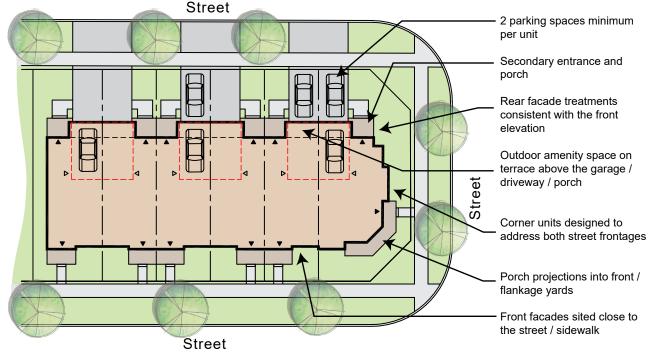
Conceptual Demonstration Site Plan For Dual Frontage Townhouses
